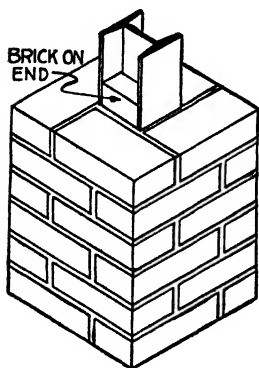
Brick-column protection. Some codes permit $2\frac{1}{2}$ -in. protection by placing brick on edge.
